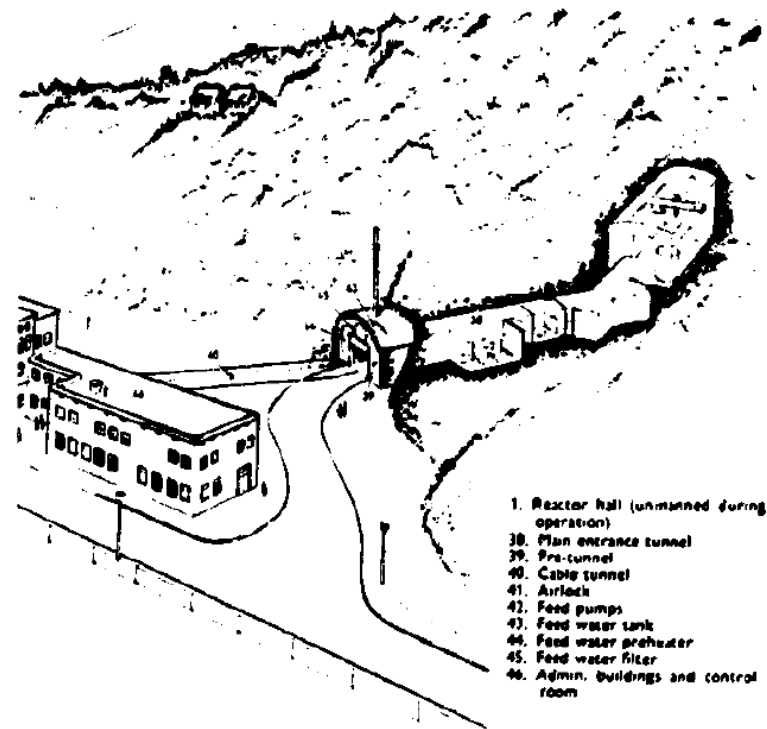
Outline Drawing of Halden's Plant (Source: Pinto S., 1979).
